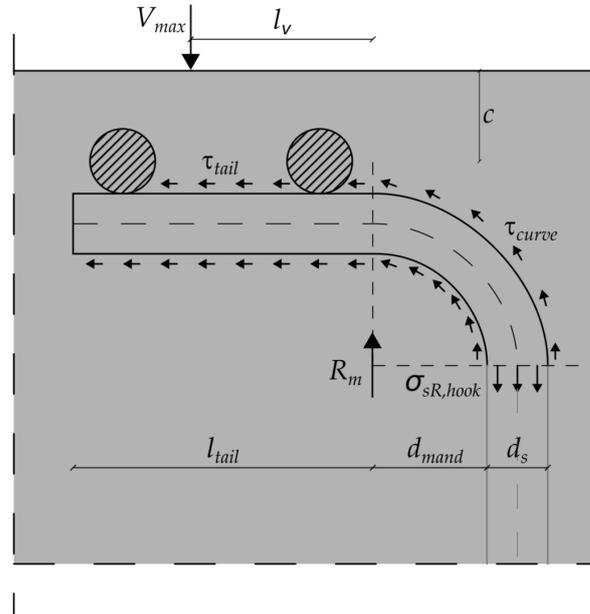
Pull-out strength of the hooked rebar anchorage
